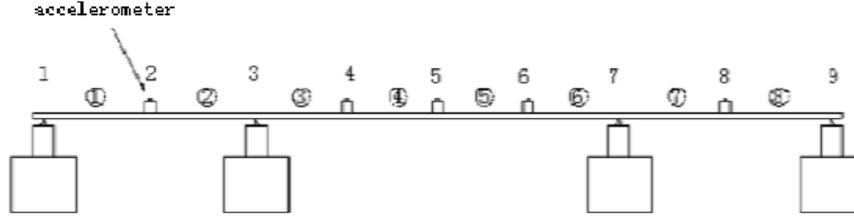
Finite element model of the three-span reinforced concrete continuous beam
